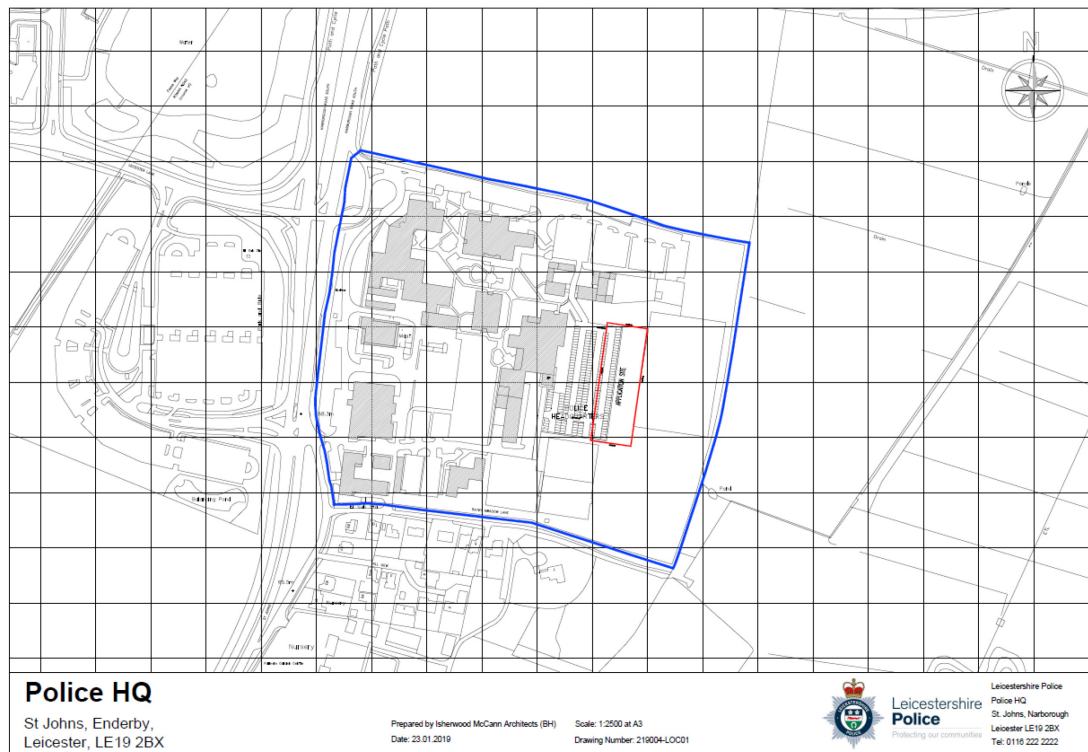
Client plan of location within the Police HQ and proposed site, three new rows of bays, general plan
